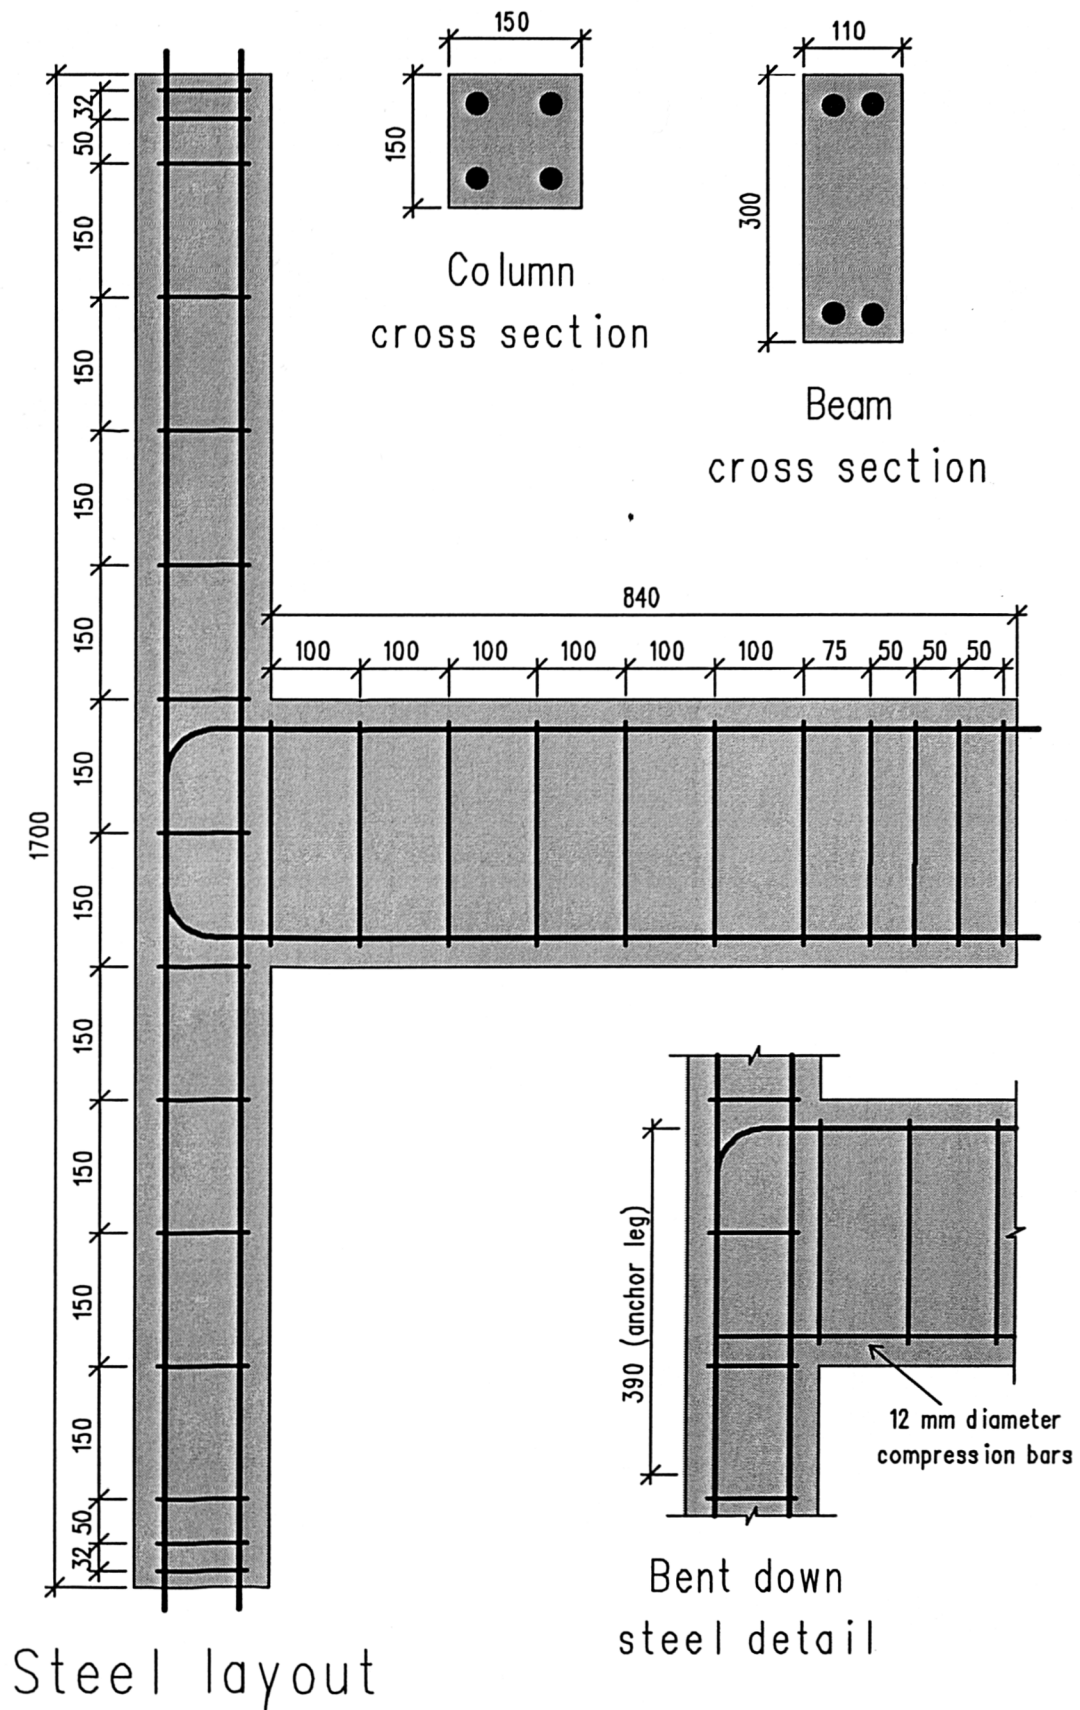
Specimen details - 300 mm deep beam
